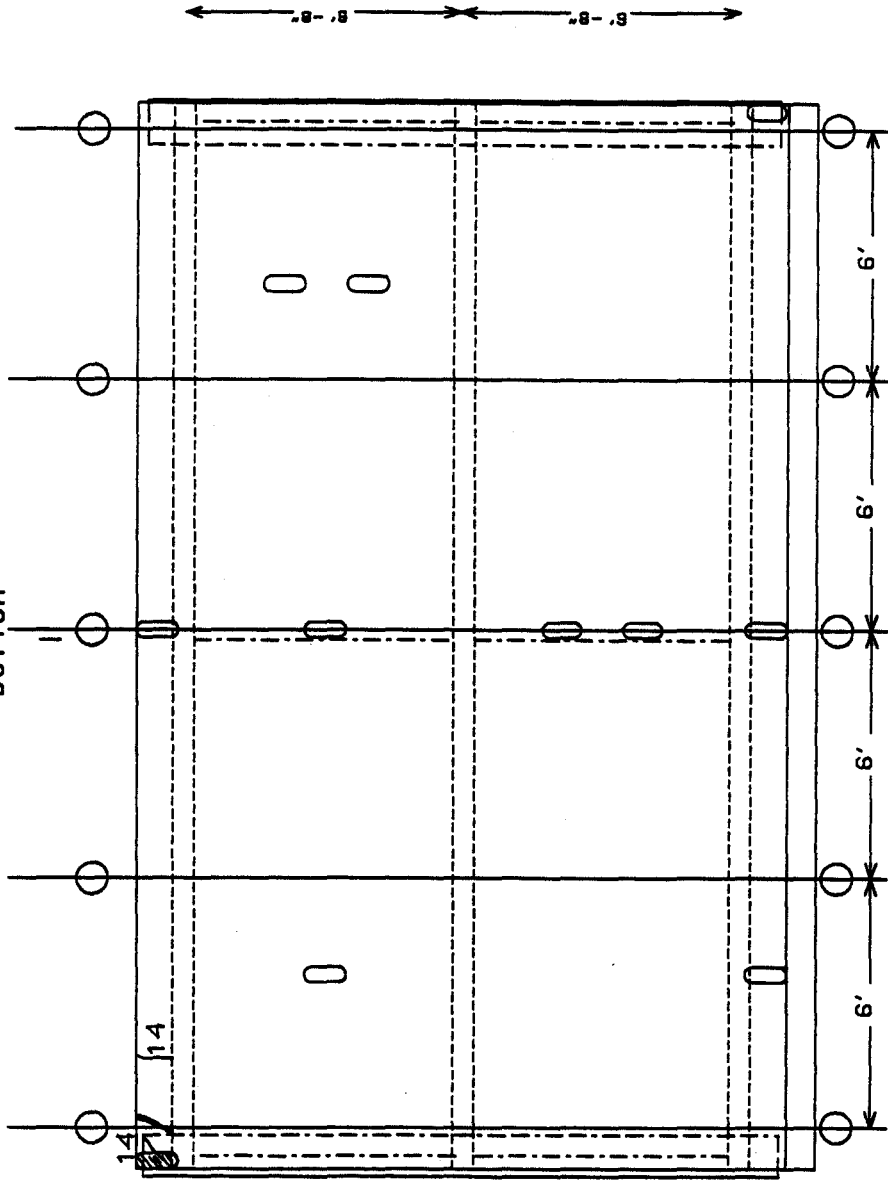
Bottom Cracking Pattern (First Bridge - Test No. 9)
